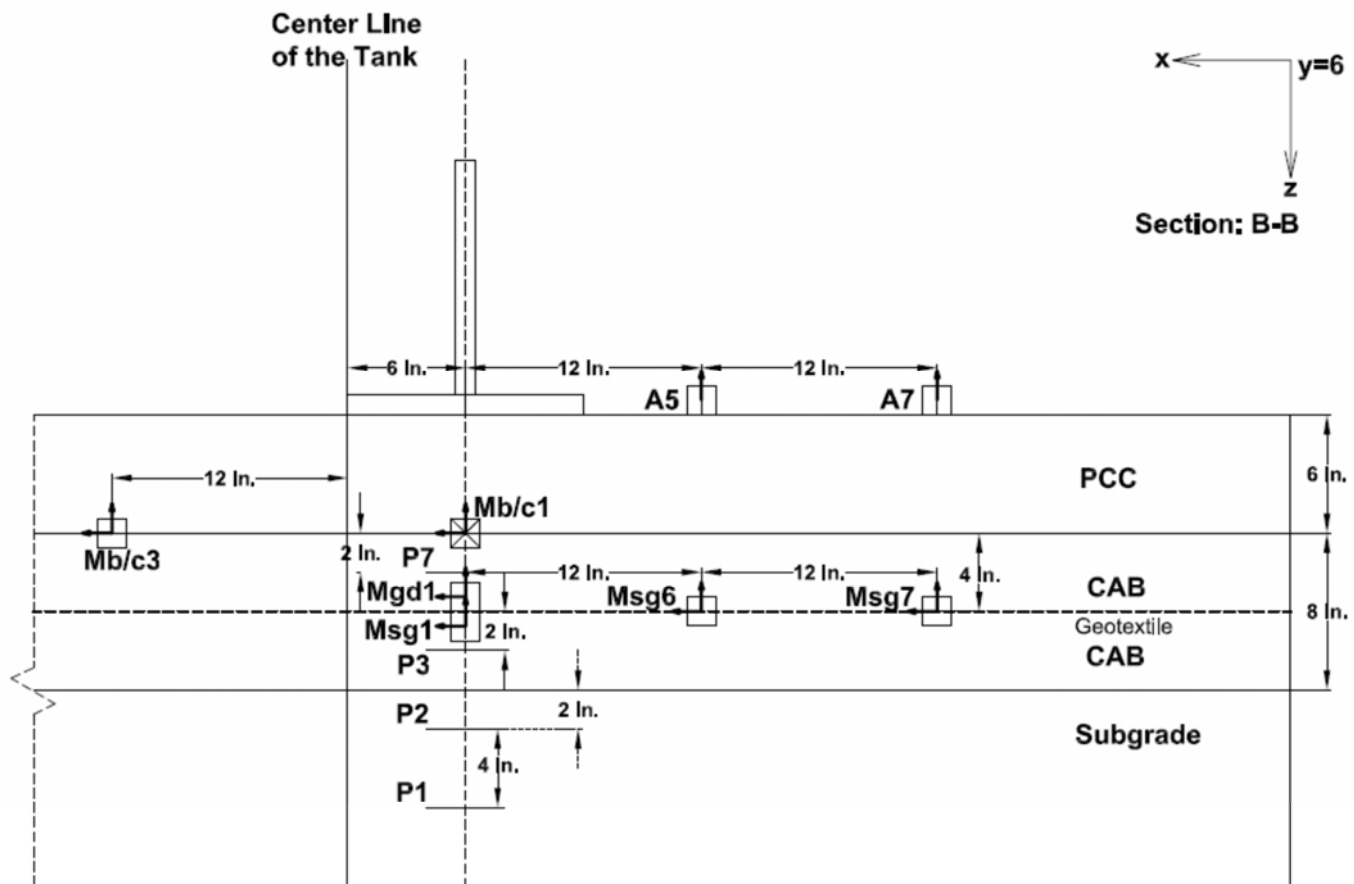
Instrumentation plan for experiment No. 10—Profile view, Y=6 inches
